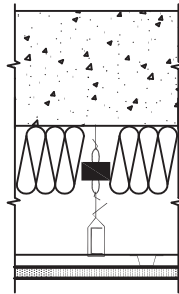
Concrete Floor-Ceiling Assemblies
